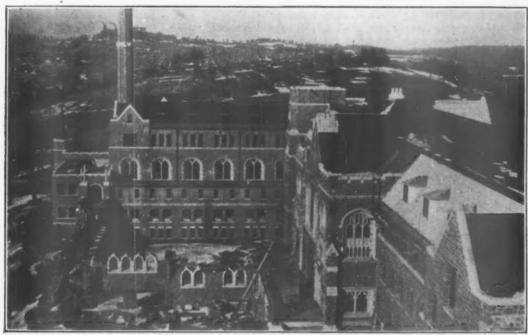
FACULTY AND LIBRARY BUILDING FROM THE SOUTH, SHOWING PASSAGEWAY UNDER CONSTRUCTION CONNECTING CHAPEL WITH NORTH WING OF GROUP
